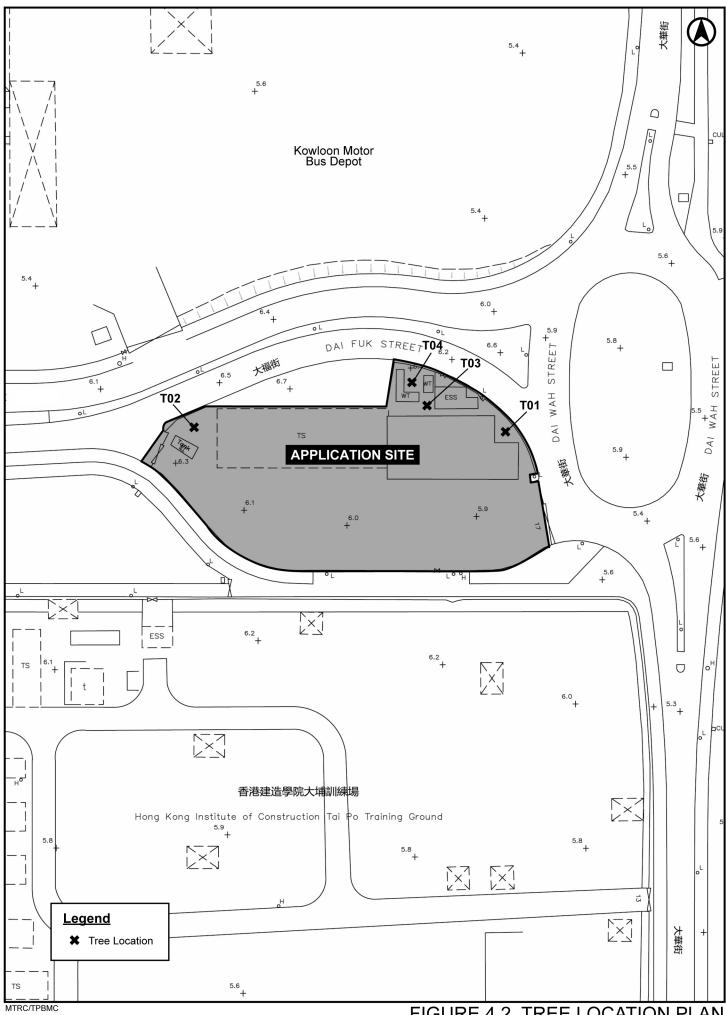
TREE LOCATION PLAN SCALE 1 : 1,000
